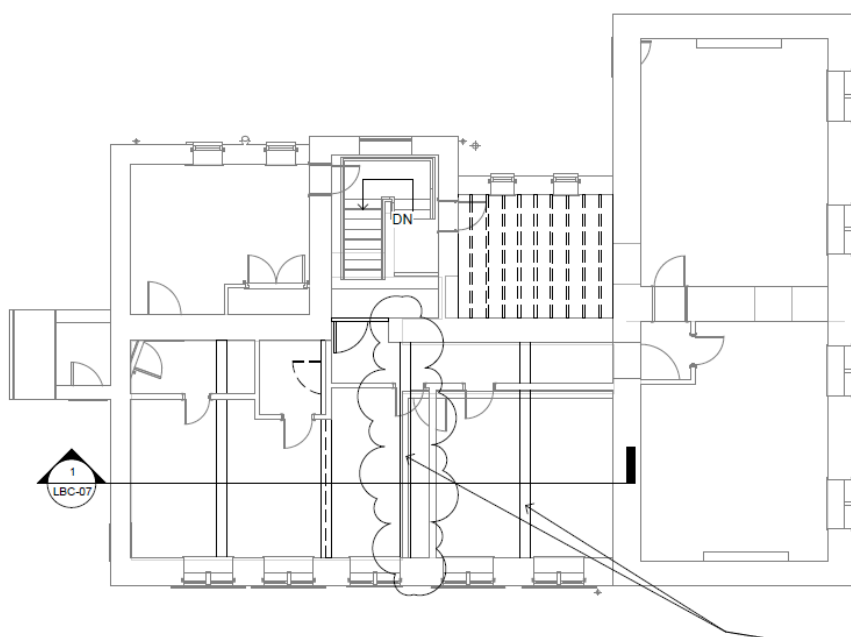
Location of Steel Beams Installed to Lounge 1, prepared by Avison Young
